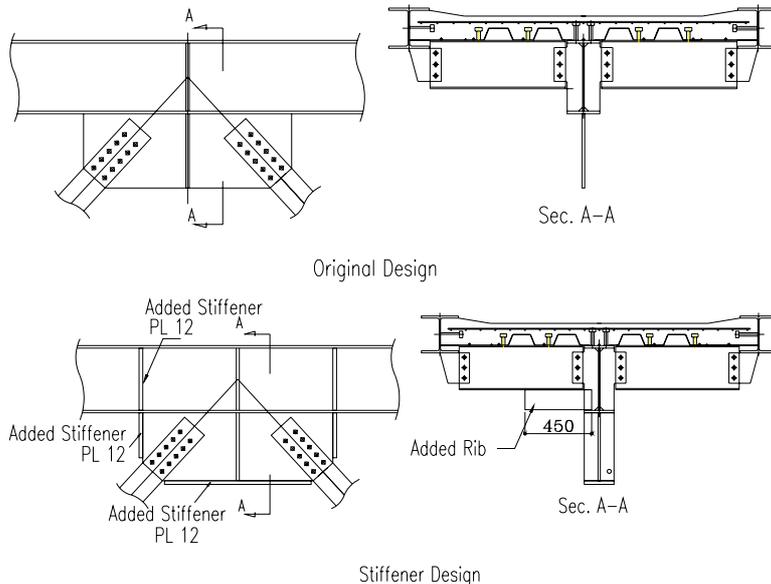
(a) Original design of the gusset plate and (b) Details of added stiffeners
